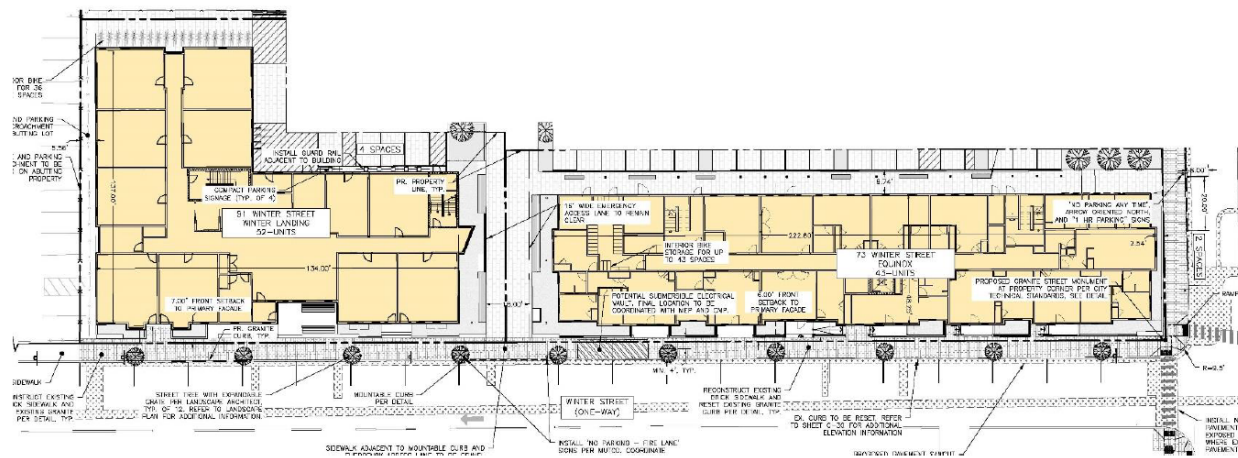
Proposed Site Plan (73 and 91 Winter Streets)
